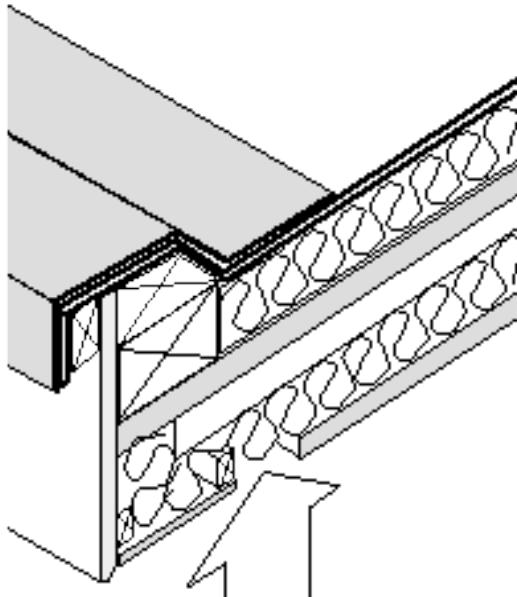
Detail of eaves in the timber deck of a warm roof. The external wall is not shown
